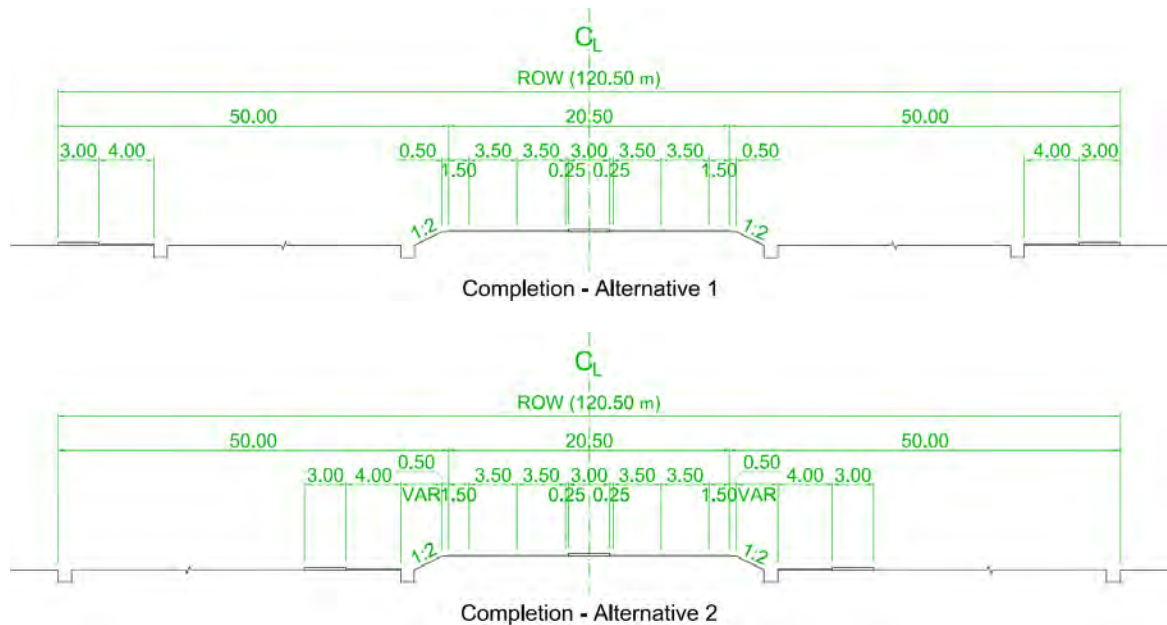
Typical Cross Sections for Nampula Southern Bypass Road (At Completion)
